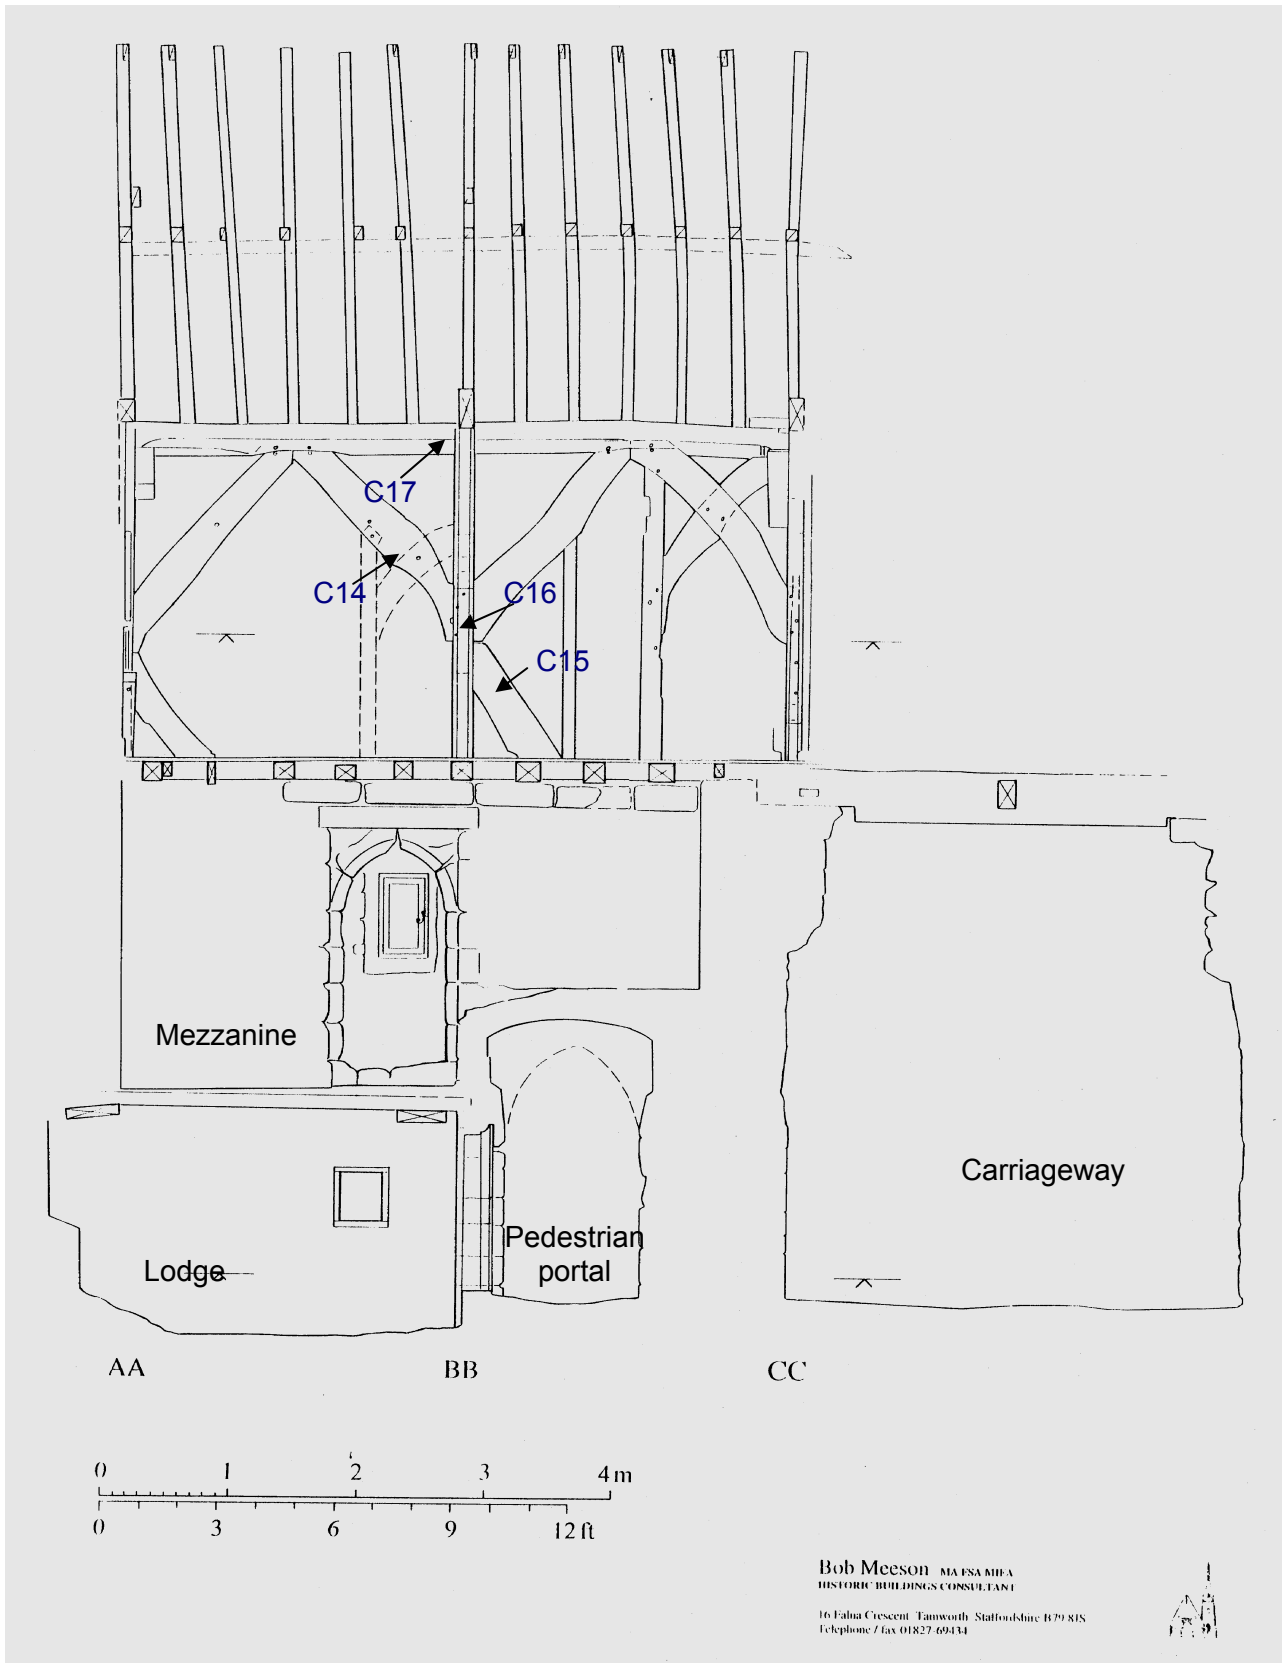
Gatehouse; drawing to show sample locations from mezzanine ceiling and south arcade (viewed looking south) (after Jean and Bob Meeson)
